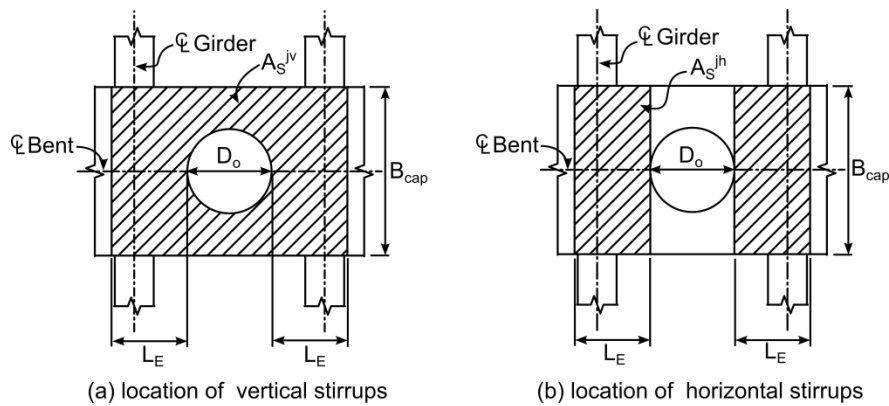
Required Location of (a) Vertical and (b) Horizontal Stirrups for the Embedded Ring Connection
